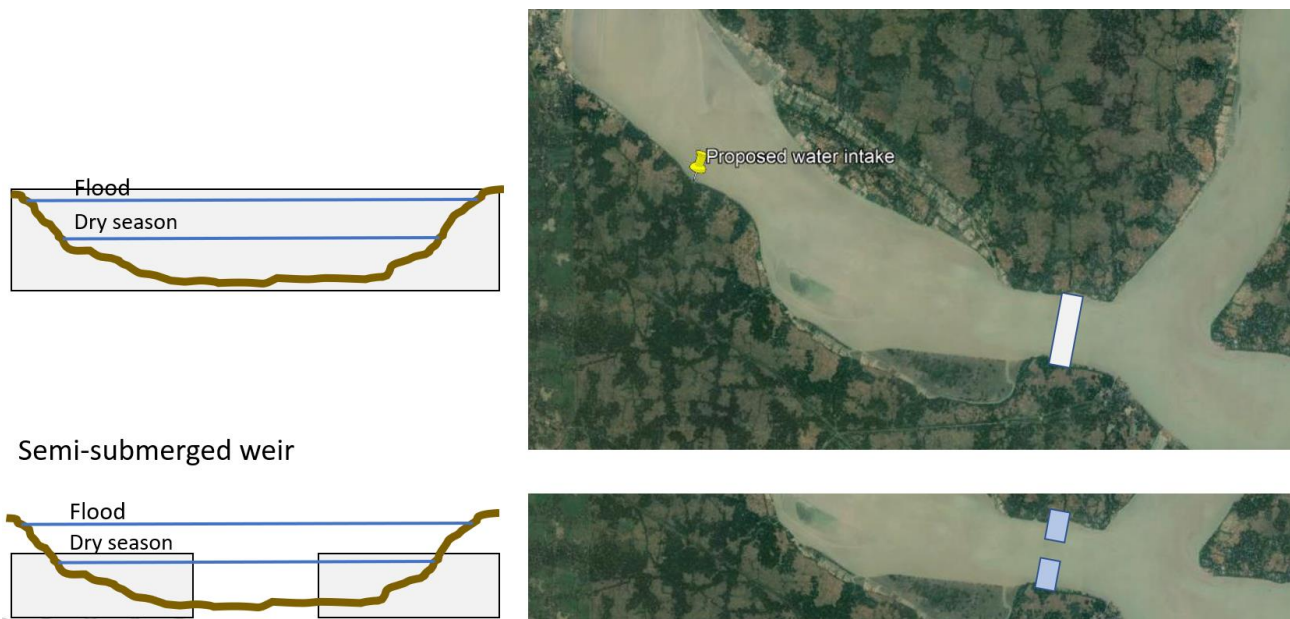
Example of the layout of a barrage or semi-submerged weir in Rupnarayan river.
